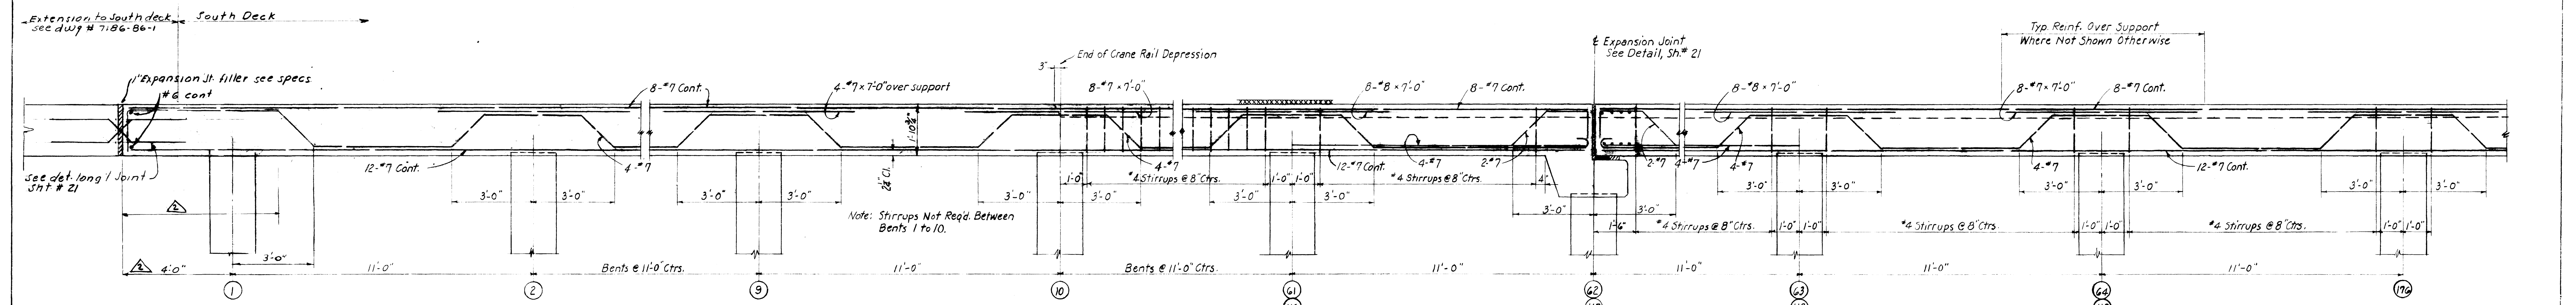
DETAIL OF CRANE BEAM ALONG LINES J-K SOUTH DECK
